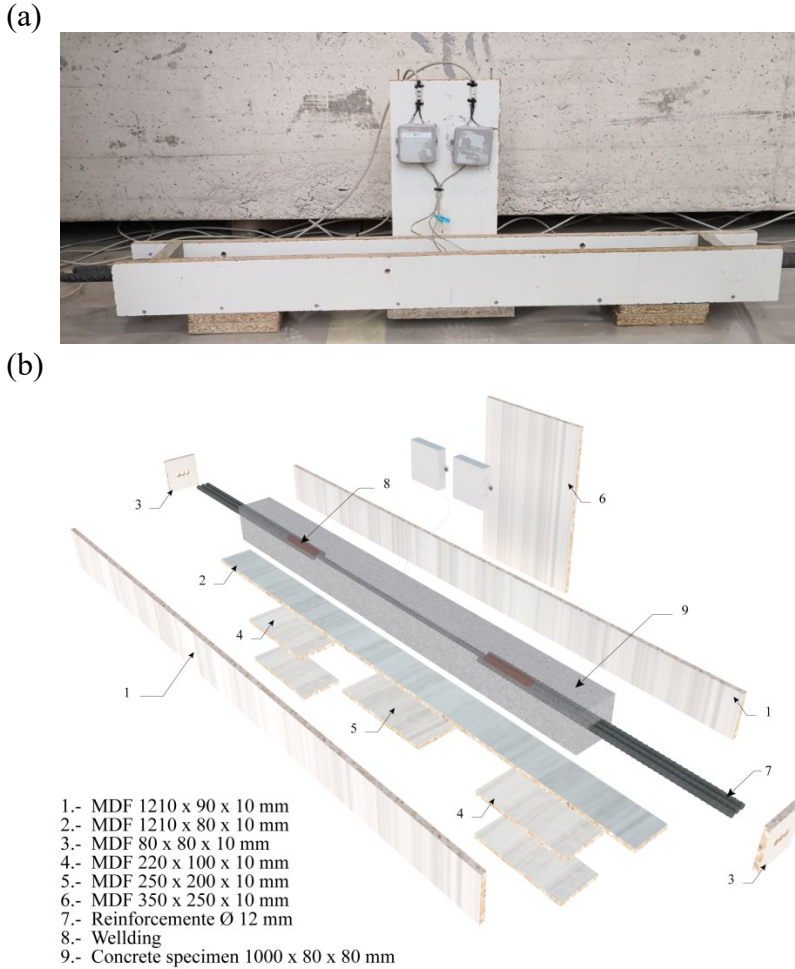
27: wooden mold detail, (a) general view of the mold (b) assembly parts of the mold.
